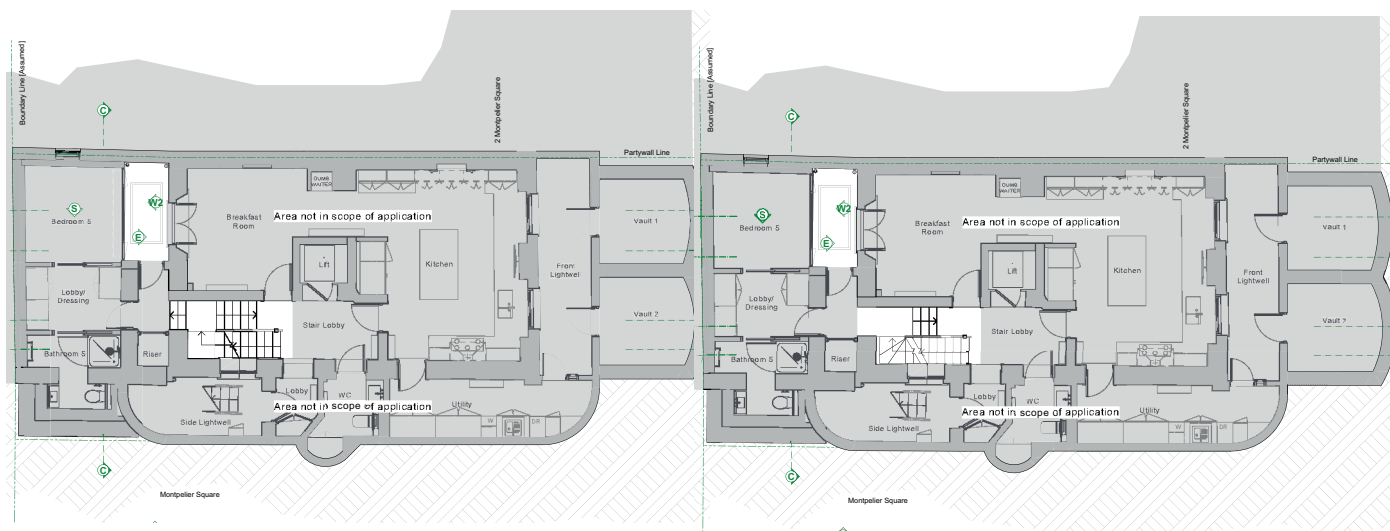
Approved (left hand side) and proposed (right hand side) lower ground floor plan
